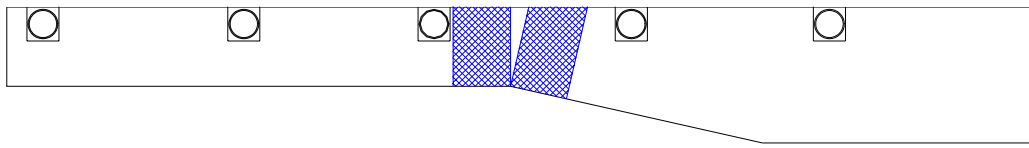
Restraint of Tensile Reinforcement in Beam Neck
